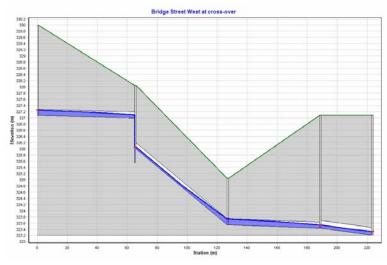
Sewer Profile along Bridge Street West at the River Cross-over
